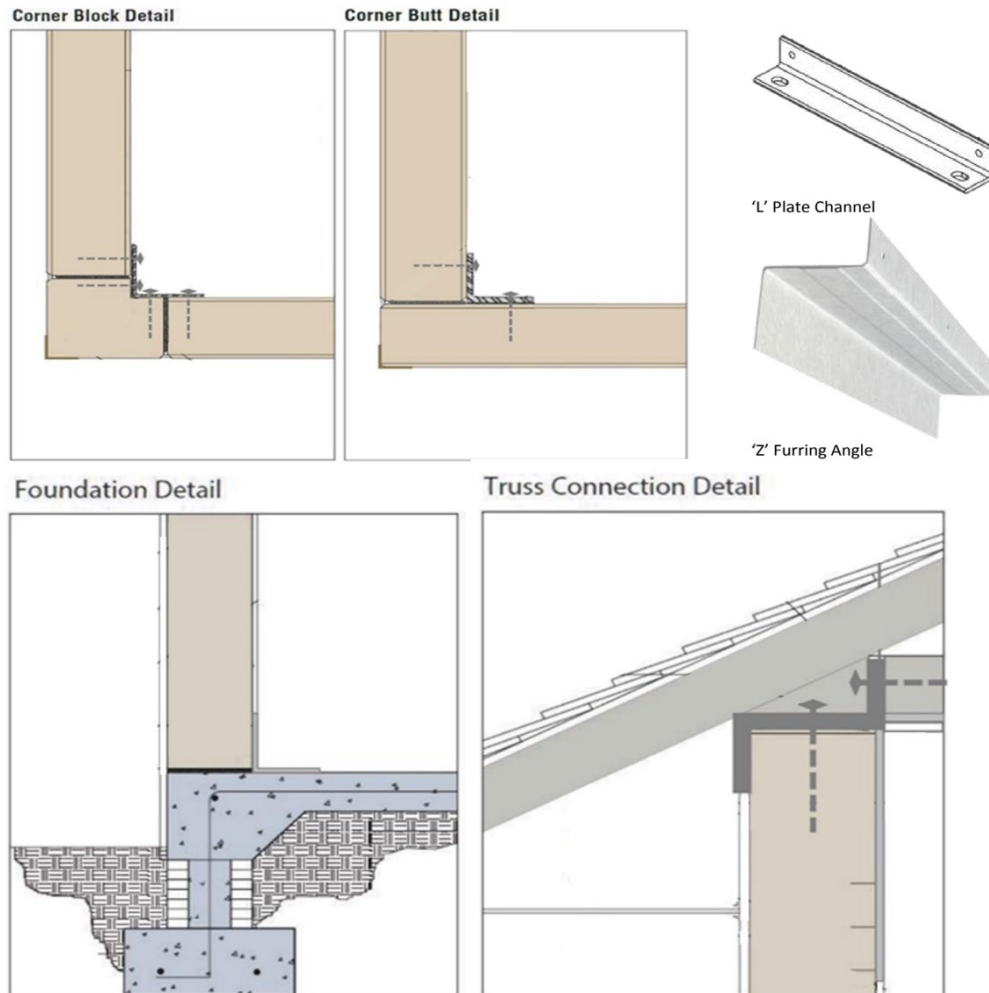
Assembly-Disassembly Details (Studiogreen 2016)
